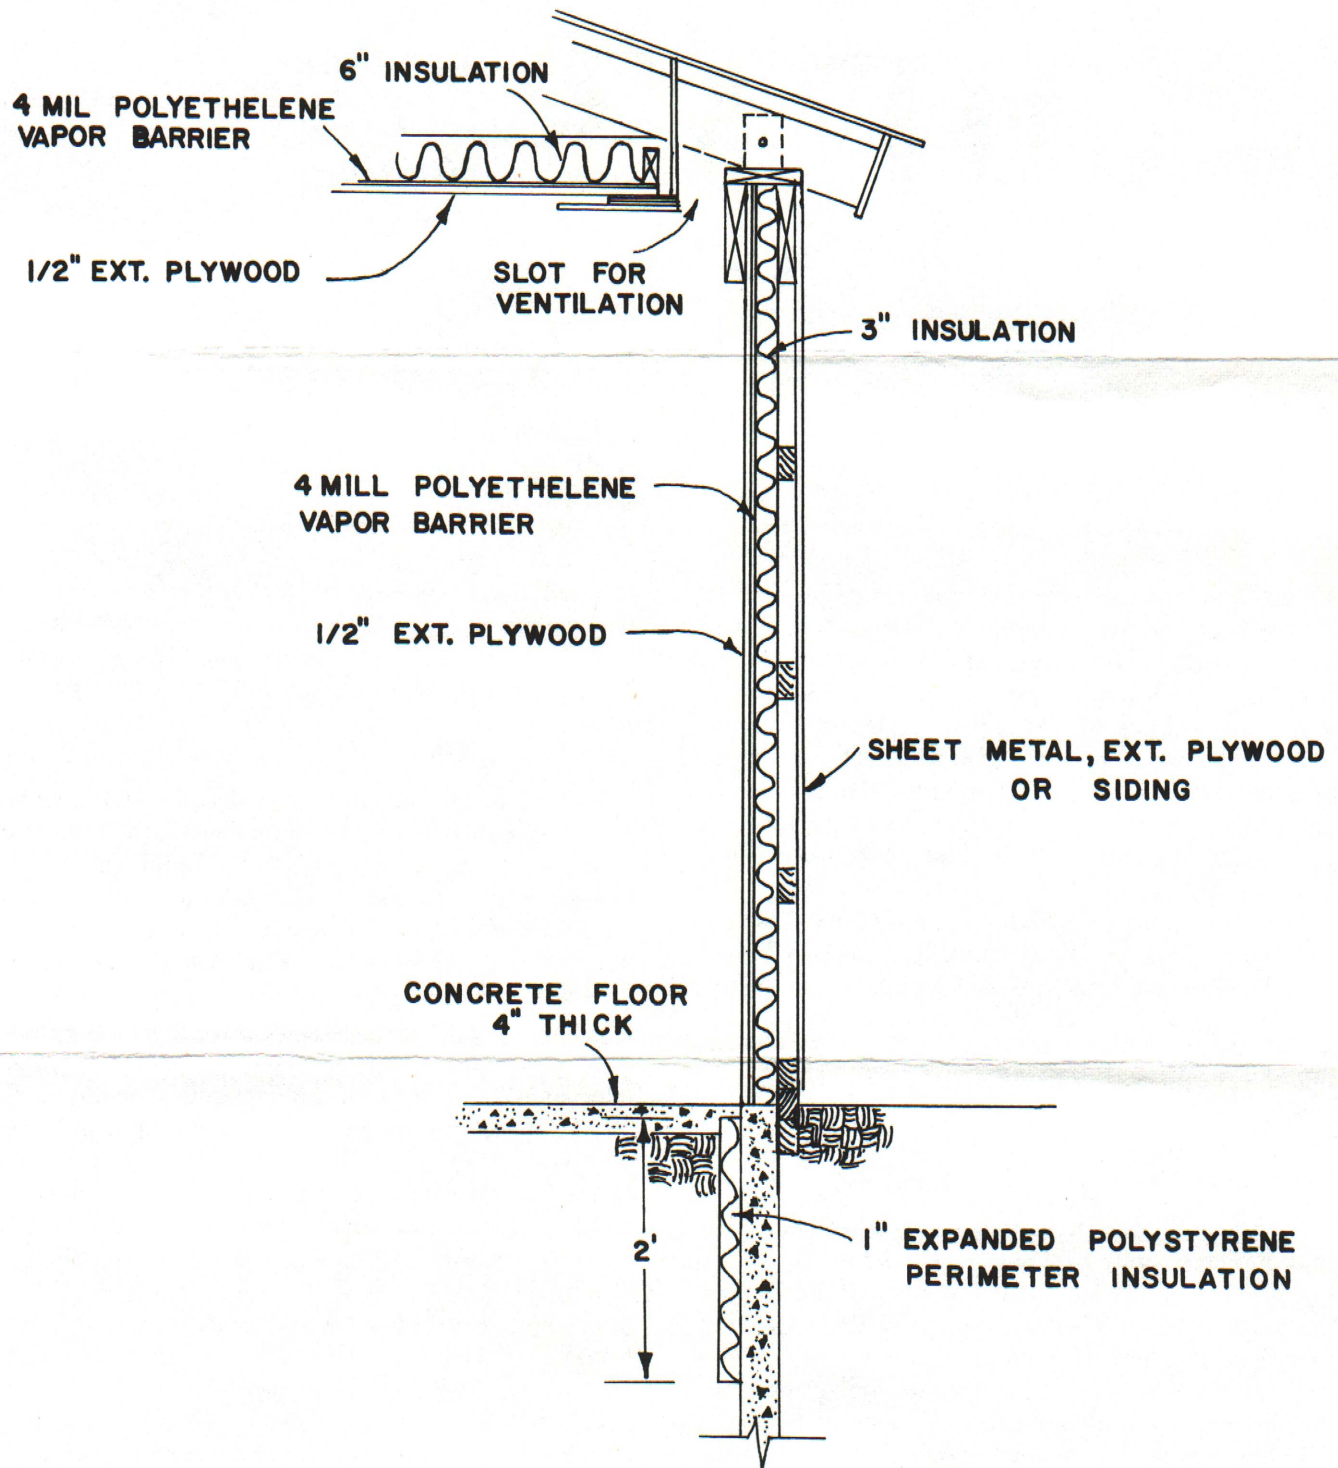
CROSS SECTION OF FRAME WALL CONSTRUCTION
